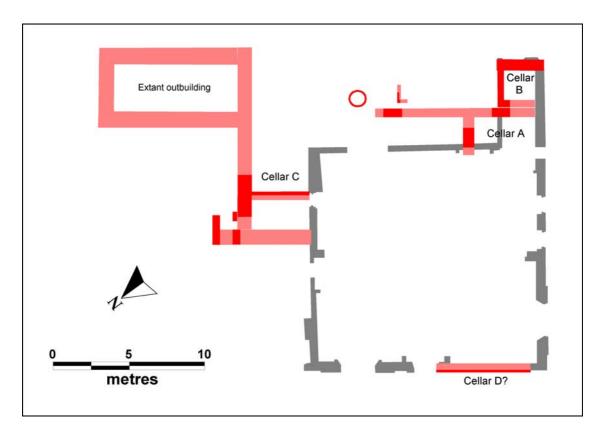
Plan of the remains of Nettlestead Hall recorded during the watching brief, and an outbuilding that incorporates 16th-century masonry
